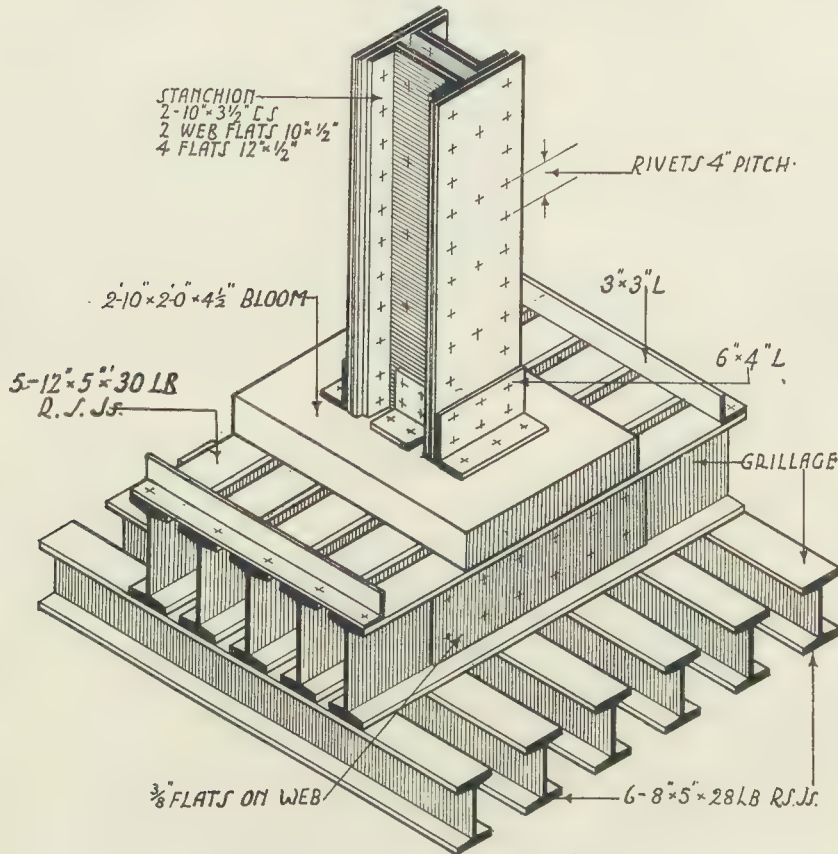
BLOOM TYPE OF STANCHION BASE AND STEEL GRILLAGE FOUNDATION
